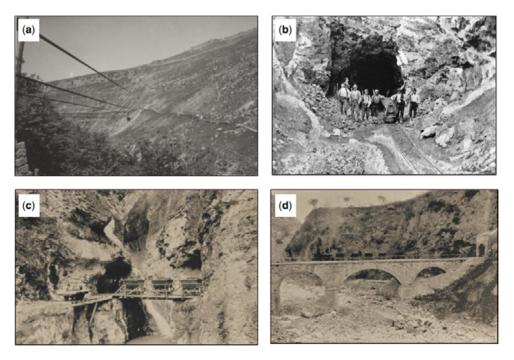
(a) Cableway system across the valley; (b) miners at the Santo Spirito mine entrance; (c) railway entry point in the 'Pilone' mine system (1903); and (d) 48 m three-arch railbridge built across the Lavinio River.
